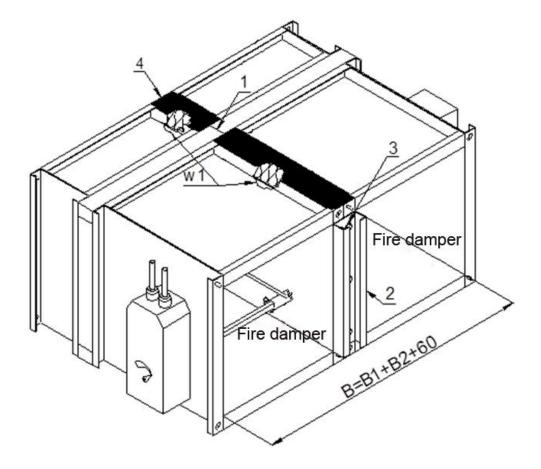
Arrangement 3 - horizontal battery consisting of two fire dampers KWP
